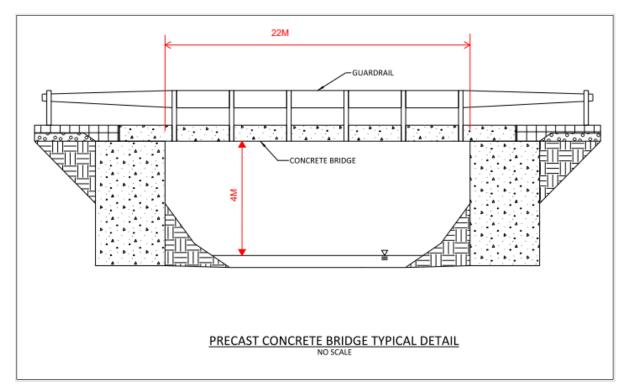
Proposed Pre-cast Concrete Bridge over the Ralappane Stream
